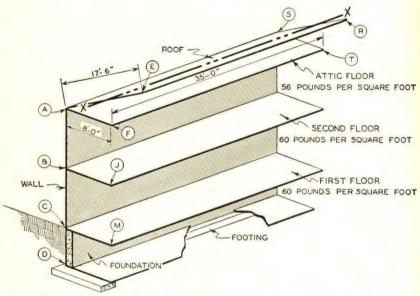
Parts of the Roof, Floors, and Outside Walls Are Supported by the Foundation
